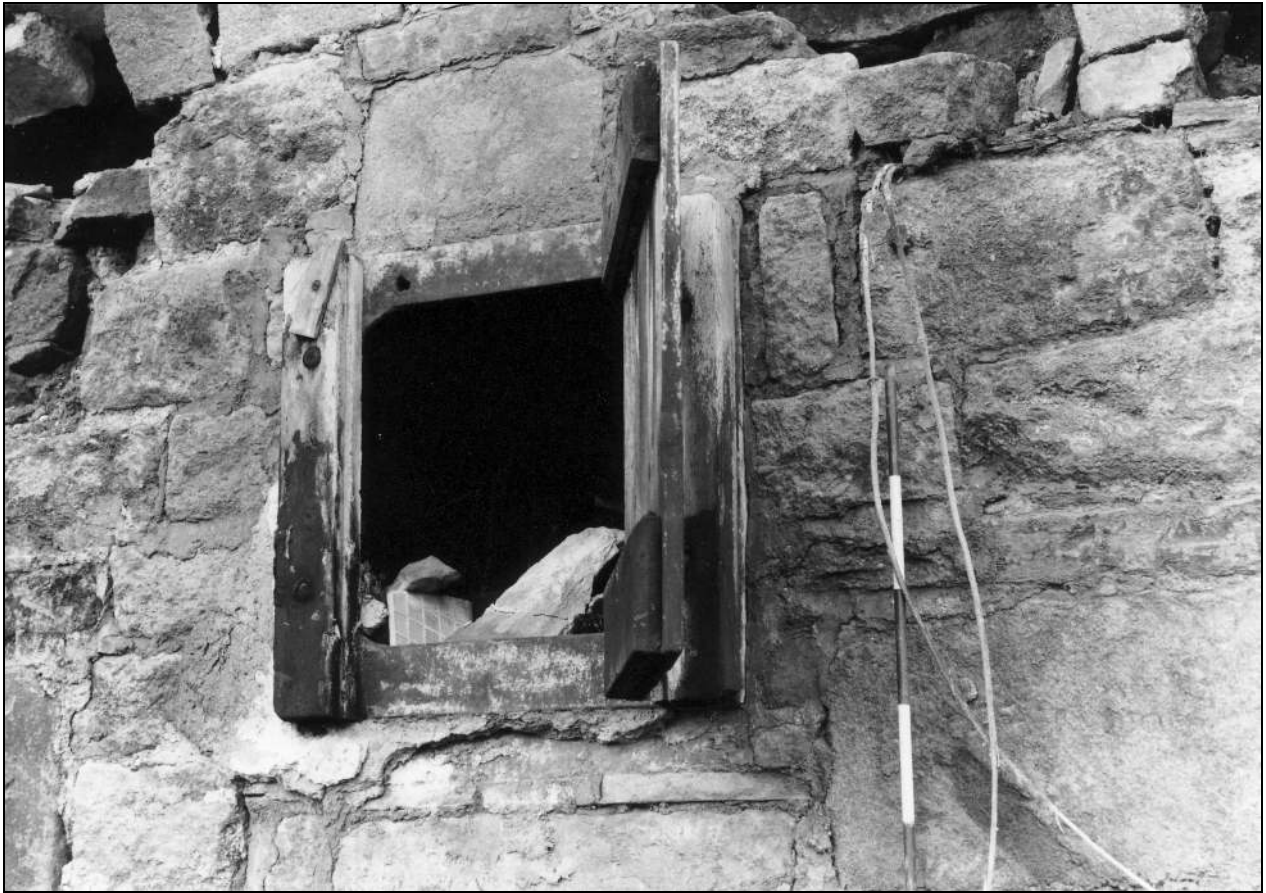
Detail of wall box in south side of boiler house, from the north (film 4, frame 18)
